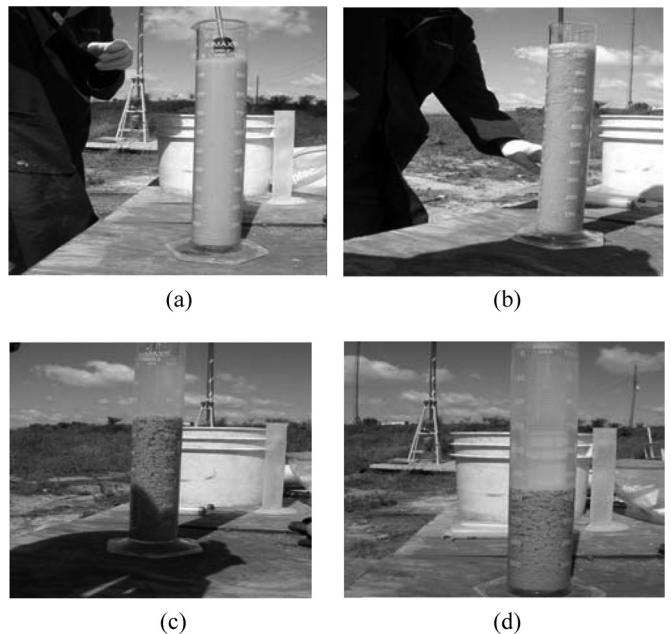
Illustration of on-site flocculation tests: (a) stirring and mixing slurry; (b) mixing slurry with flocculant; (c) clay settling; (d) after settling for about two minutes.
